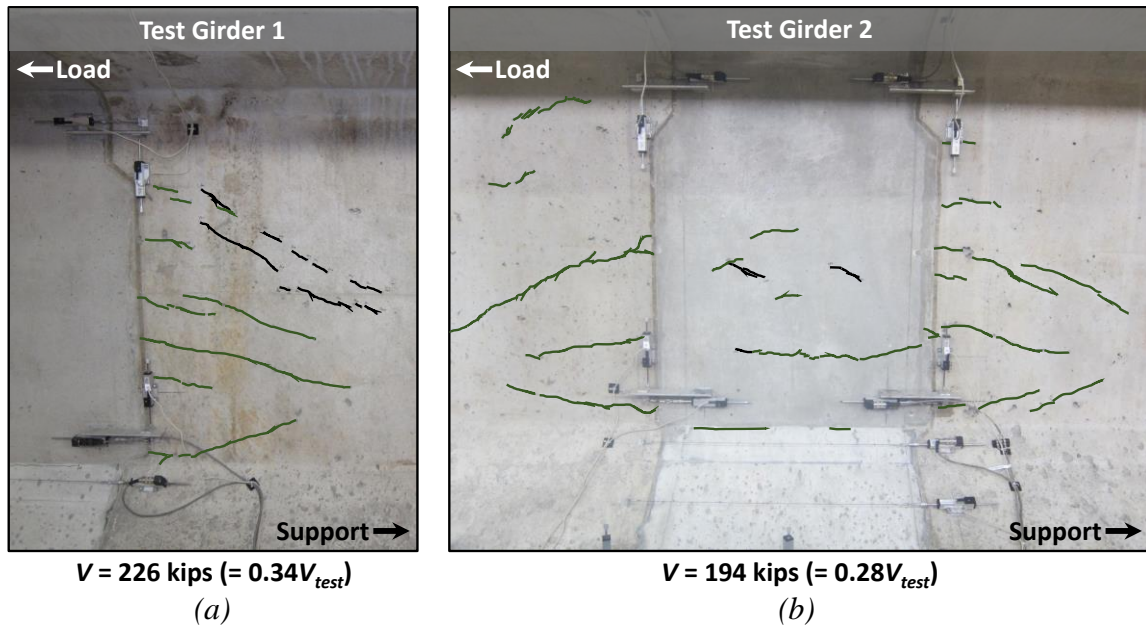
First cracks during load tests – (a) Test Girder 1; (b) Test Girder 2
